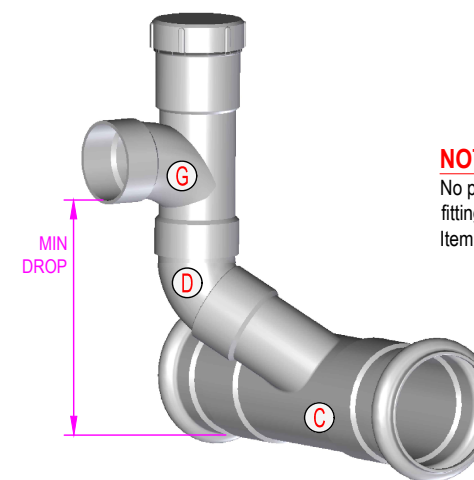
D : MINIMUM DROP ARRANGEMENT
